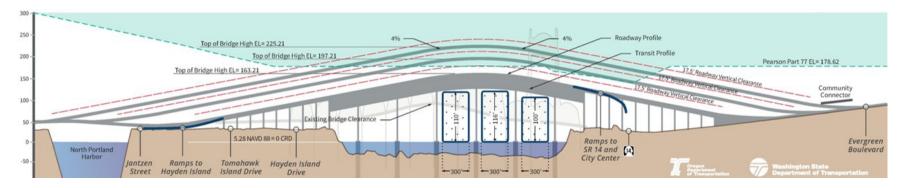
Bridge Profile: High-level Fixed Span Bridge
